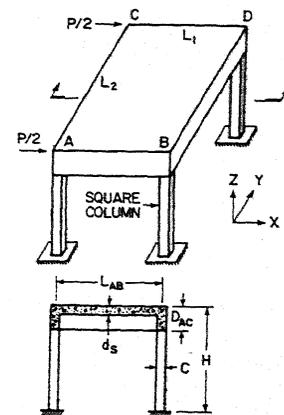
SINGLE-STORY, SINGLE-PANEL FRAMED STRUCTURE
